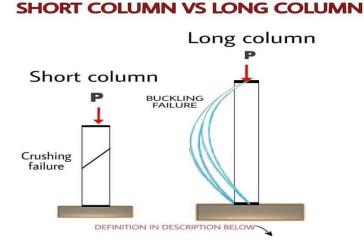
Short and Long Column (Jonathan Strahan, 2011)
